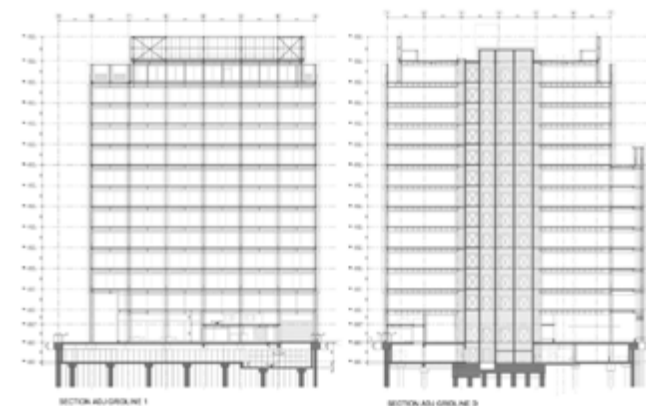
TYPICAL SECTIONS THROUGH BUILDING
